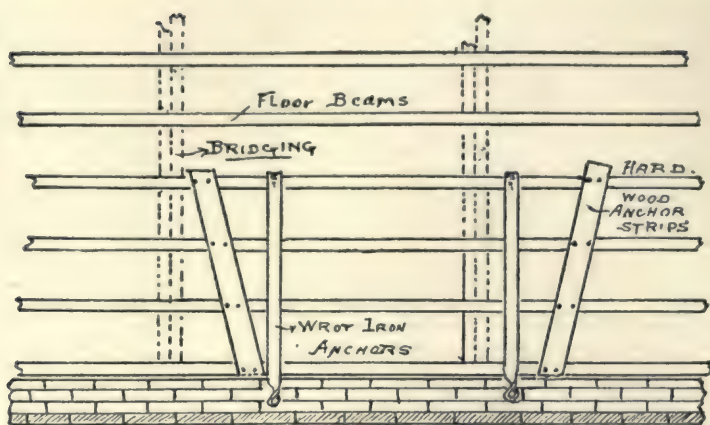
Plan of Floors, Showing Method of Anchoring Front and Rear Walls to Beams.
